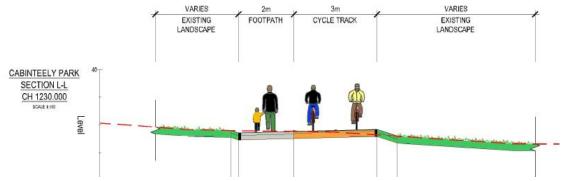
Cross Section for proposals on Cabinteely Greenway in Section C
